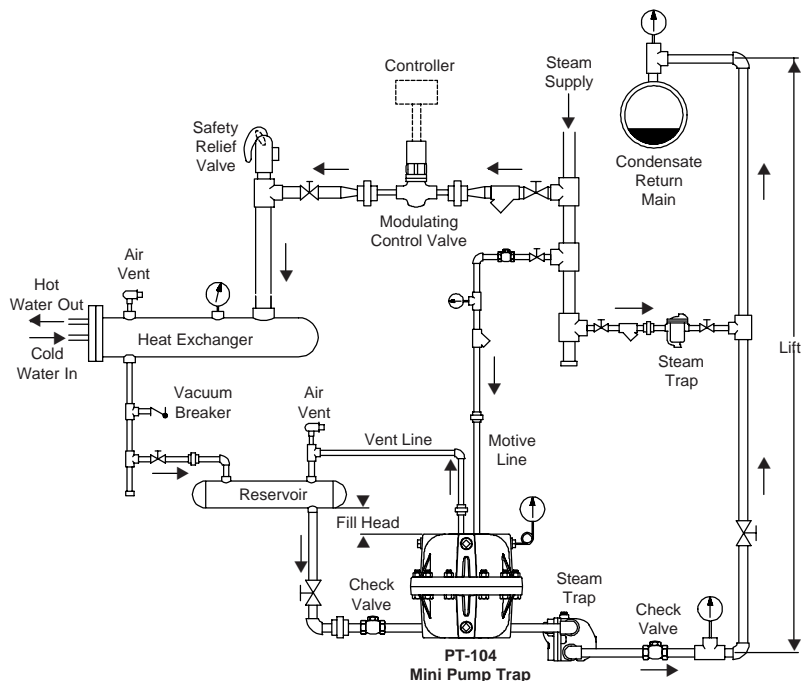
Drainage from heat exchange equipment in a closed-loop system where the discharge pressure may be higher or lower than the back pressure. If the heat exchange equipment pressure exceeds the back pressure, the pump trap will be idle and the steam trap will prevent the steam from "blowing through" into the return line. If the system steam pressure is always lower than the back pressure, a steam trap is not required. The pump and check valve combination will act as both the pump and the trap.
